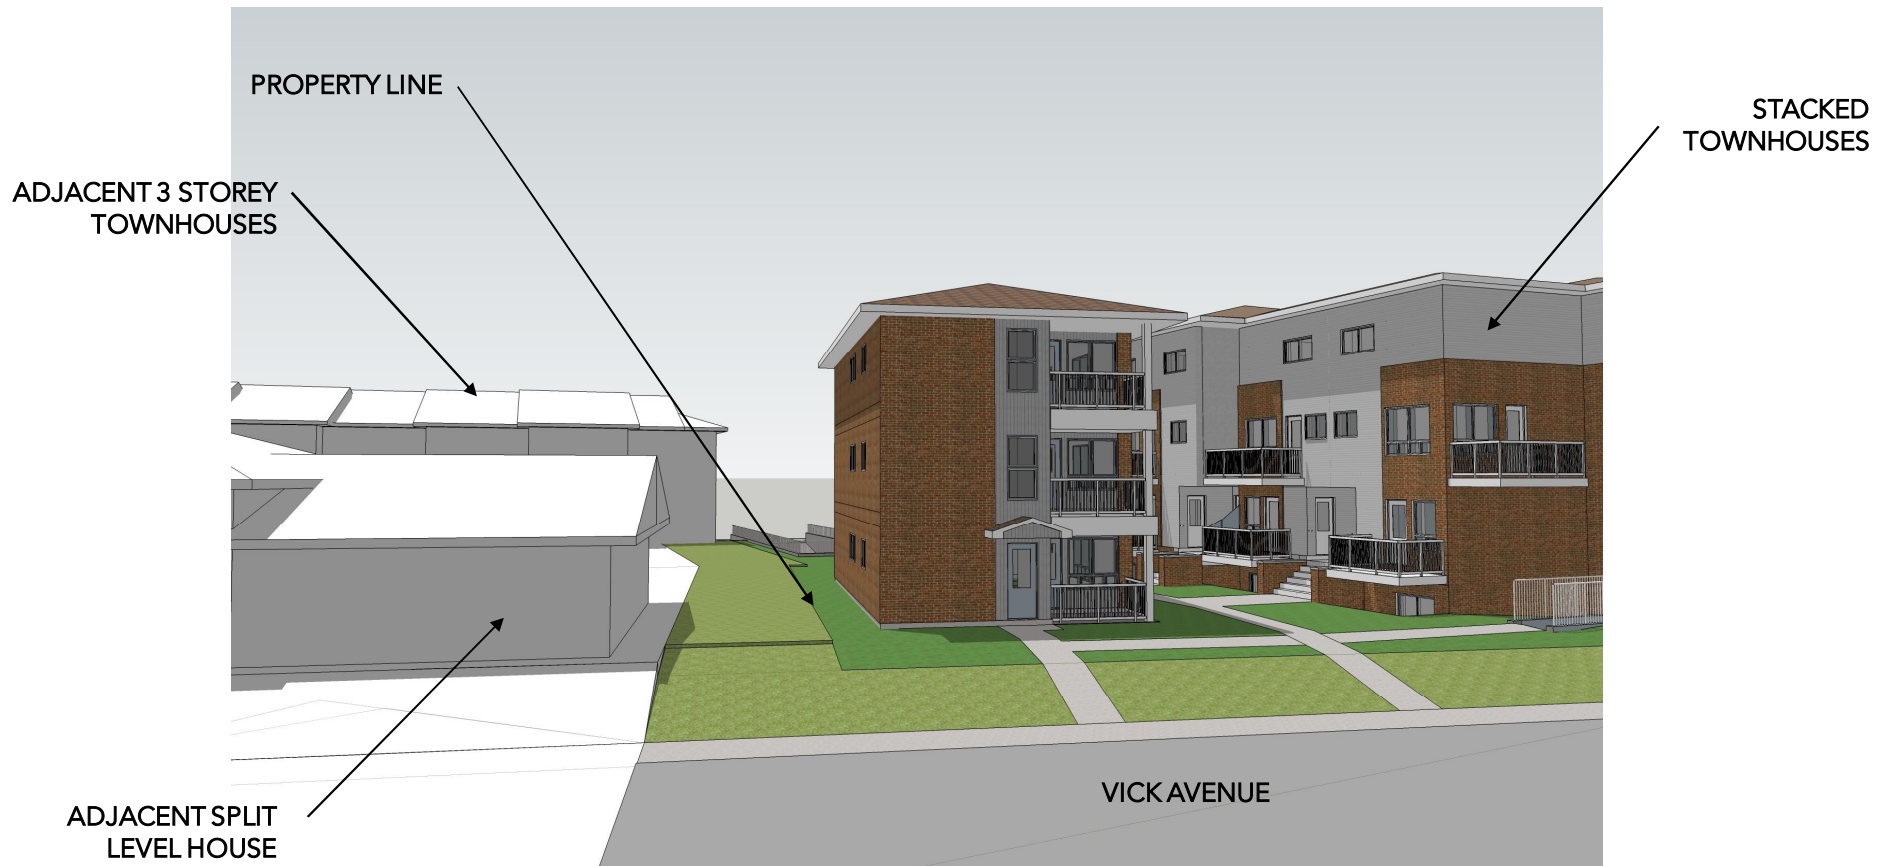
VIEW OF PROPOSAL – NORTH WEST VIEW OF SITE FROM CARLING
